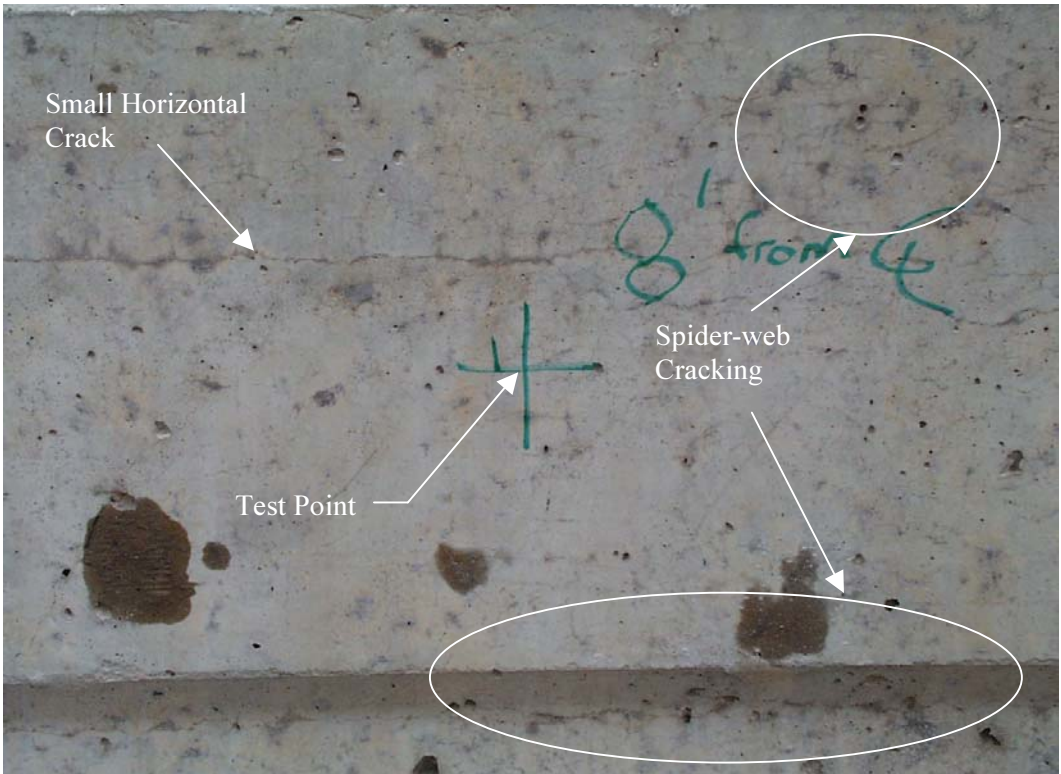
Photo of the Test Point 8 feet from Centerline on BG1
